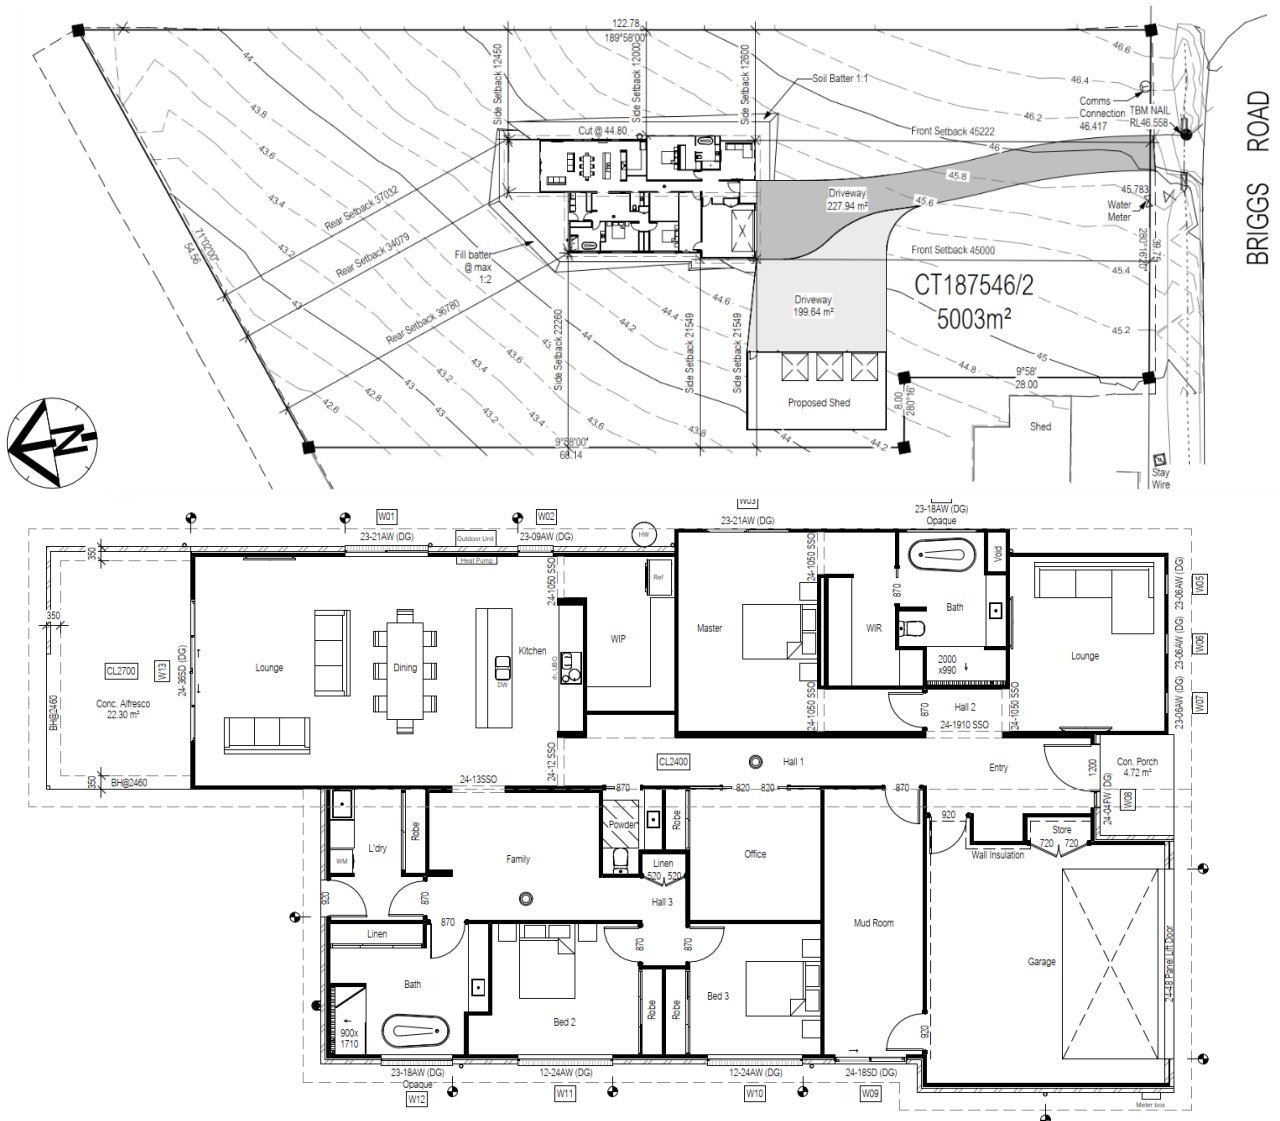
Proposed dwelling, extracted from project drawings. Top: Dwelling layout on property. Bottom: Dwelling layout.
